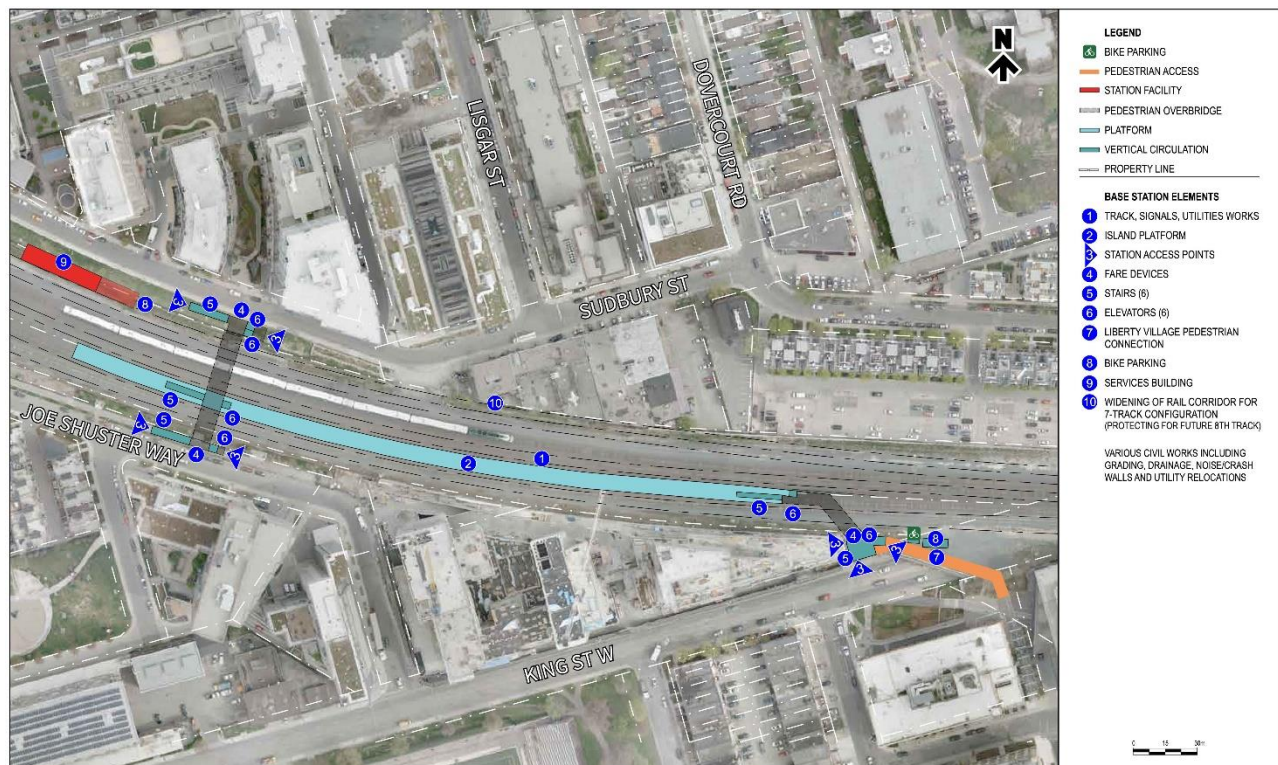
Conceptual plan of King-Liberty Station. Source: Metrolinx (February 2023). Note: Station planshown above is indicative and does not represent a final design.
